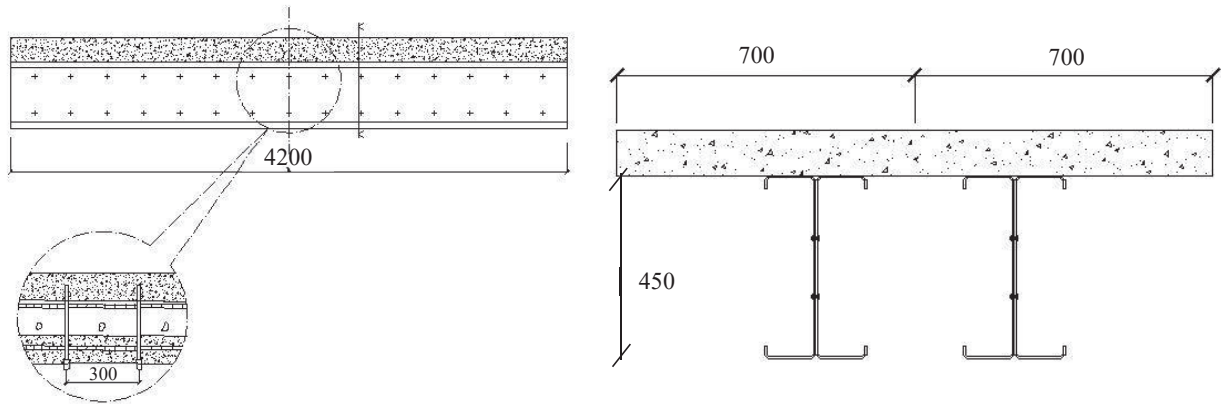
Concrete slab and CSF beam specimen – lay-out
